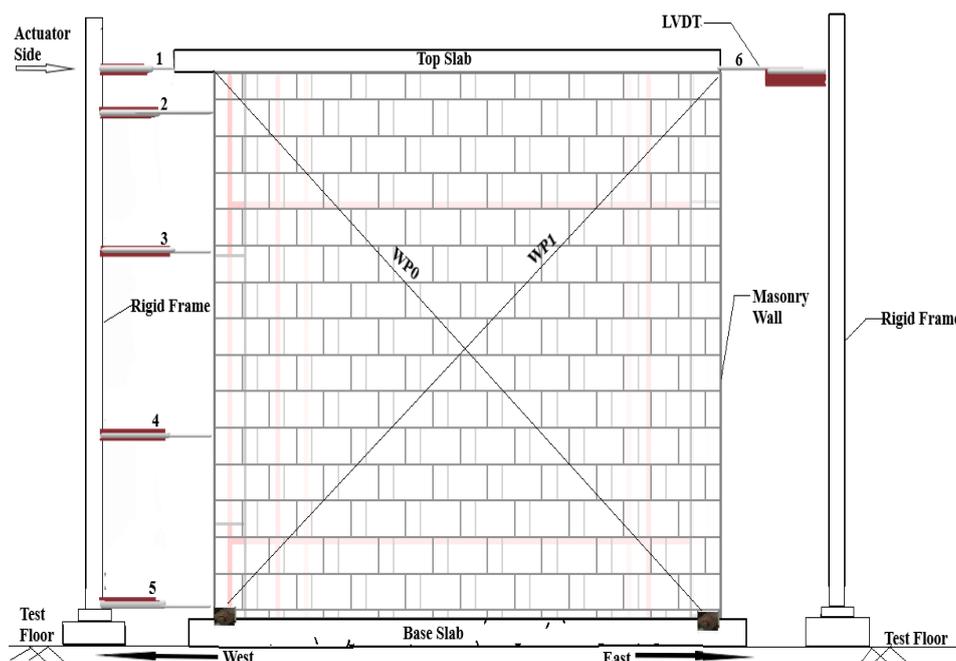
Positions of LVDTs and wire Potentiometers in URBM and S\_URBM structures (Right face of wall from actuator side. Similar configuration was adopted for left face too.)
